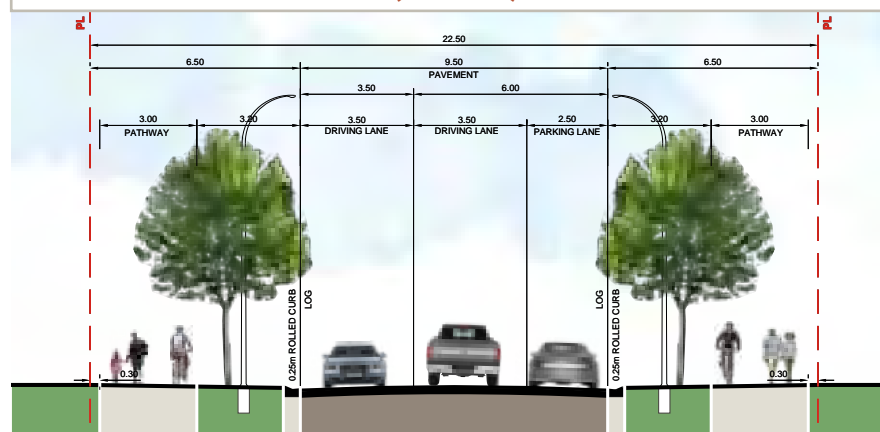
MODIFIED COLLECTOR ROAD SECTION (23.2M)
